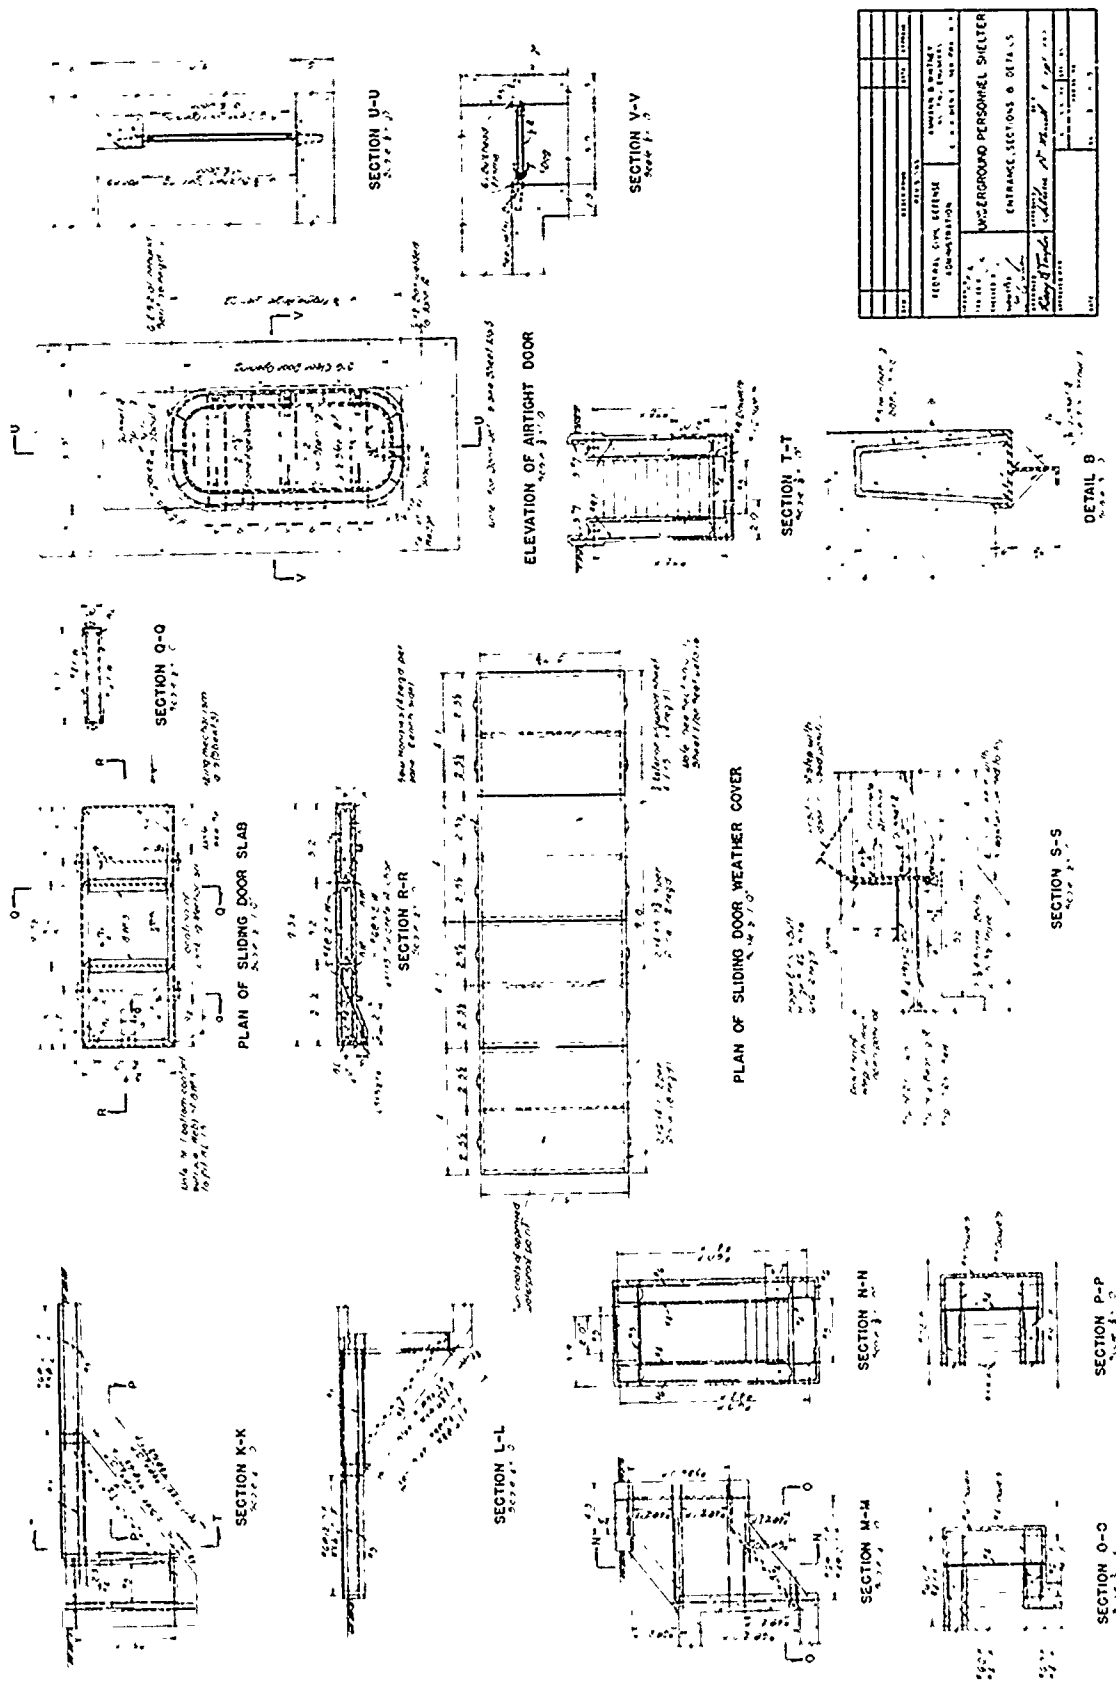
Entrance, sections, and details, underground personnel shelter.
